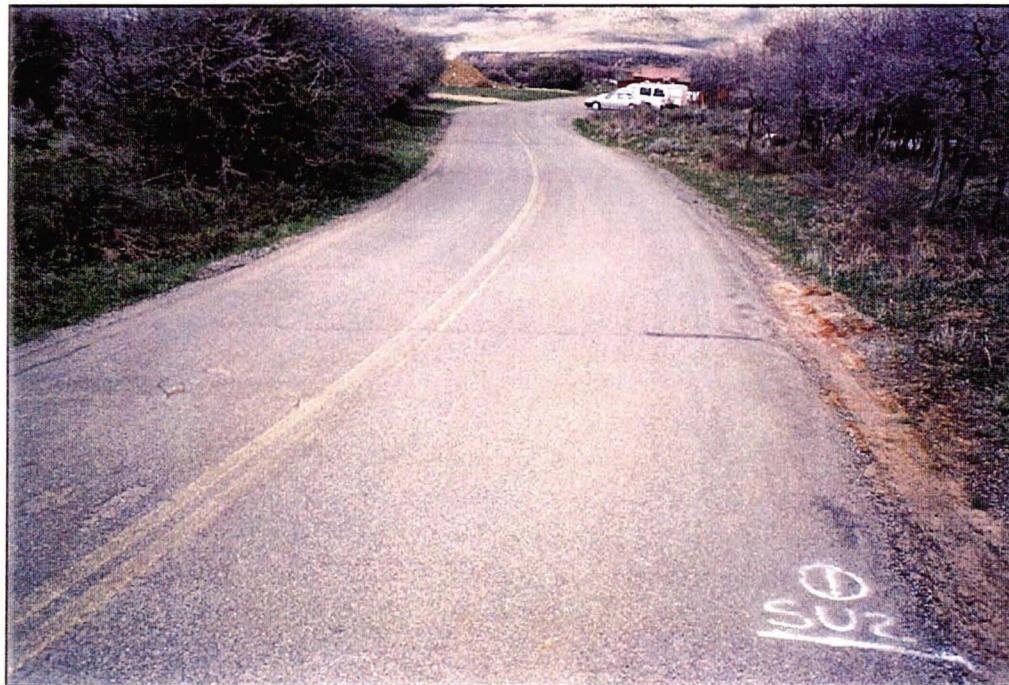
Section 1, Sample Unit 2 (MP 0.04)
